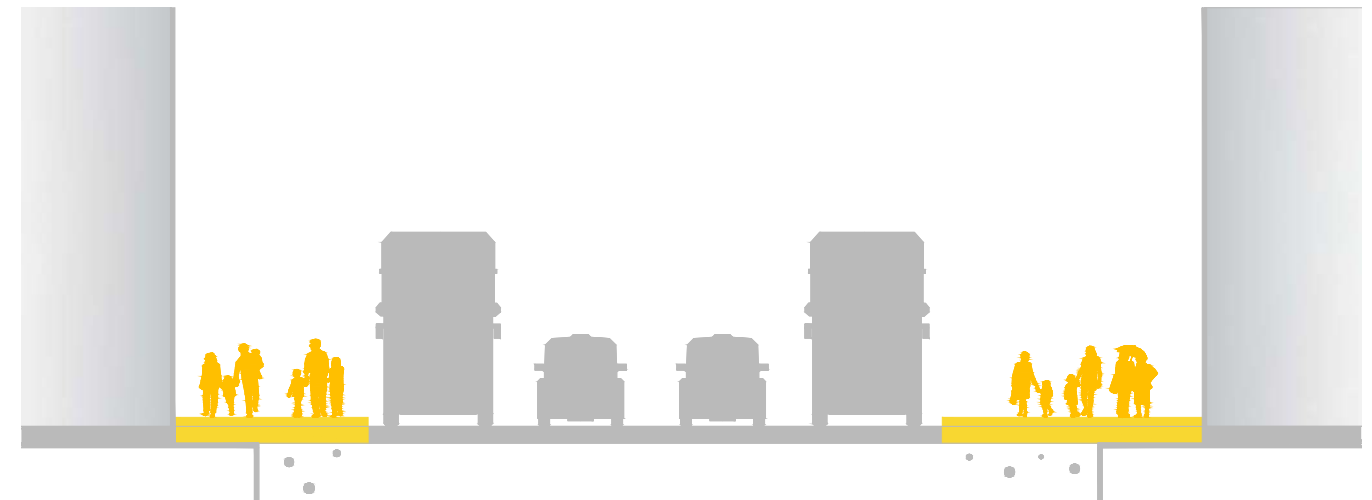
Typical Victoria Street Section (Building - Building 22.7m, Carriageway 12.6m, Footways 4.3m - 5.7m)
